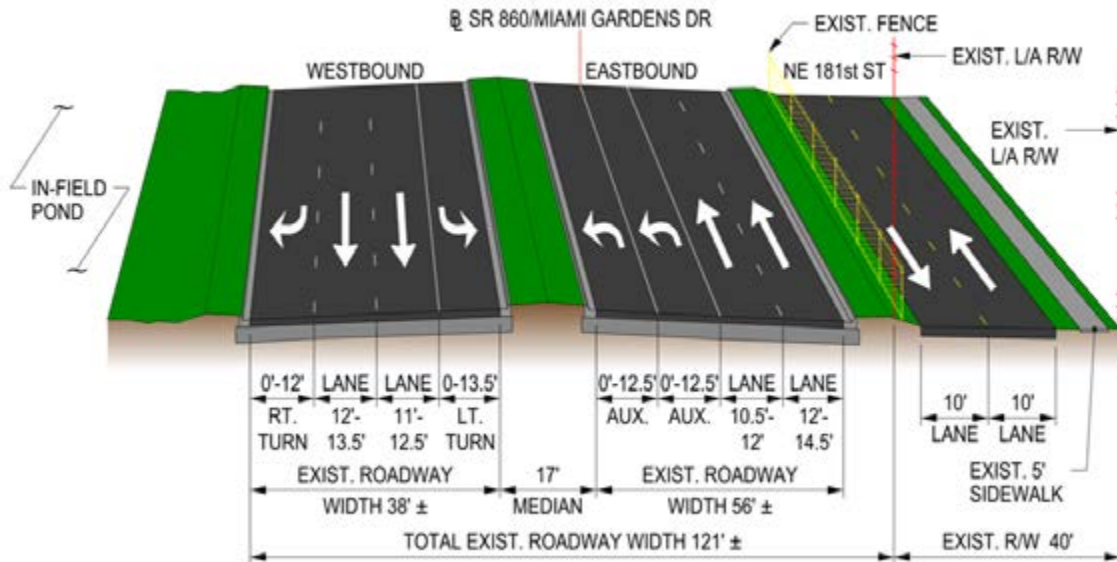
3: Existing Typical Section – SR 860/Miami Gardens Drive
